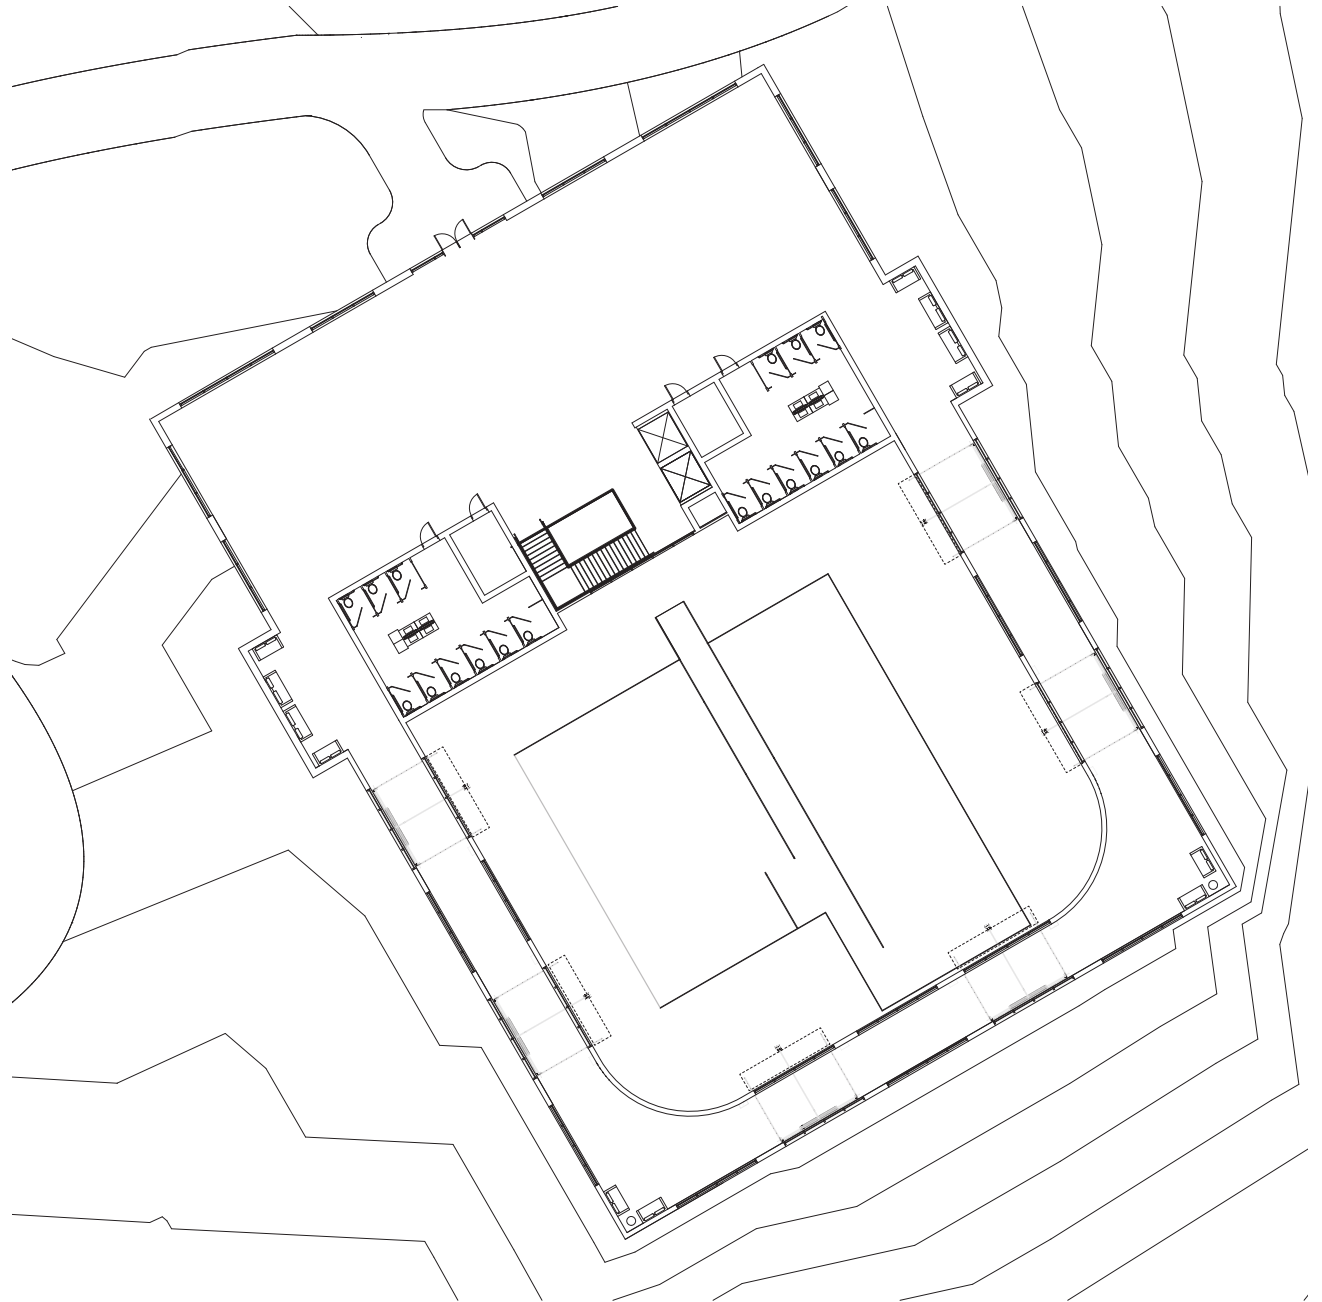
ACTIVITY BUILDING SECOND FLOOR PLAN
